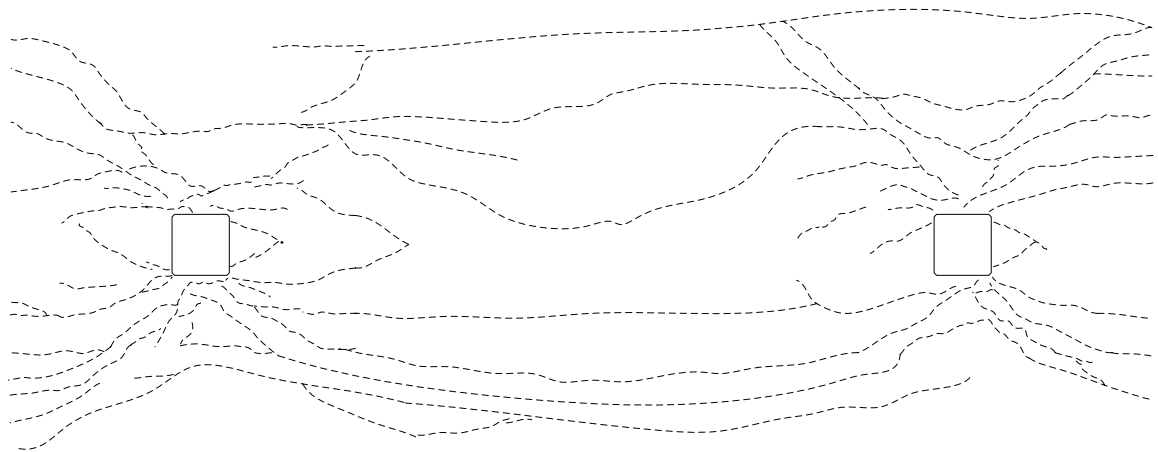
Level 3-2A and 2B Bottom Slab Cracks (South 3% Roof Drift)
